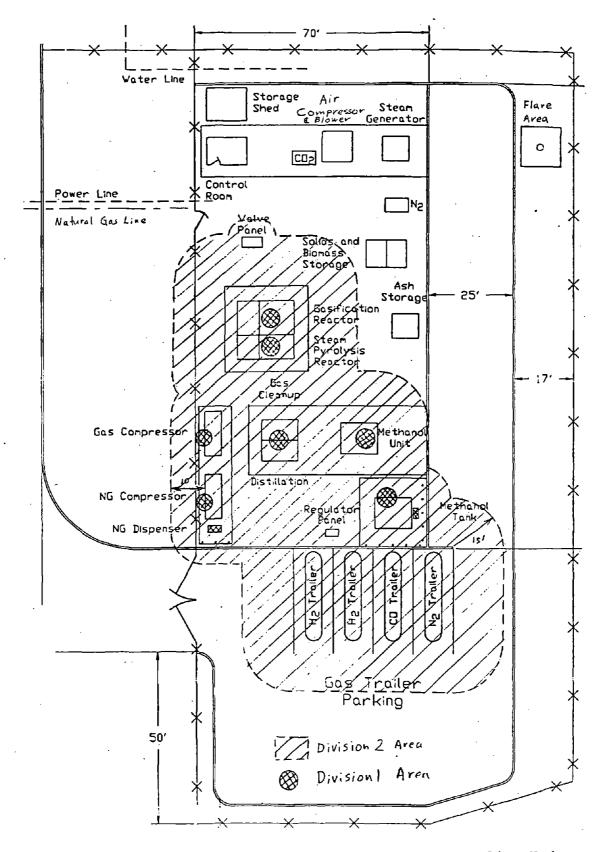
Hazardous area classifications for Hynol facility electrical installation.
